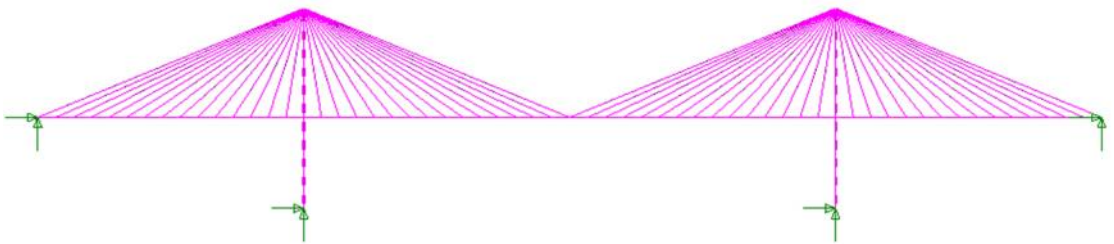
Cable stayed bridge fan system with pylon height 60m
